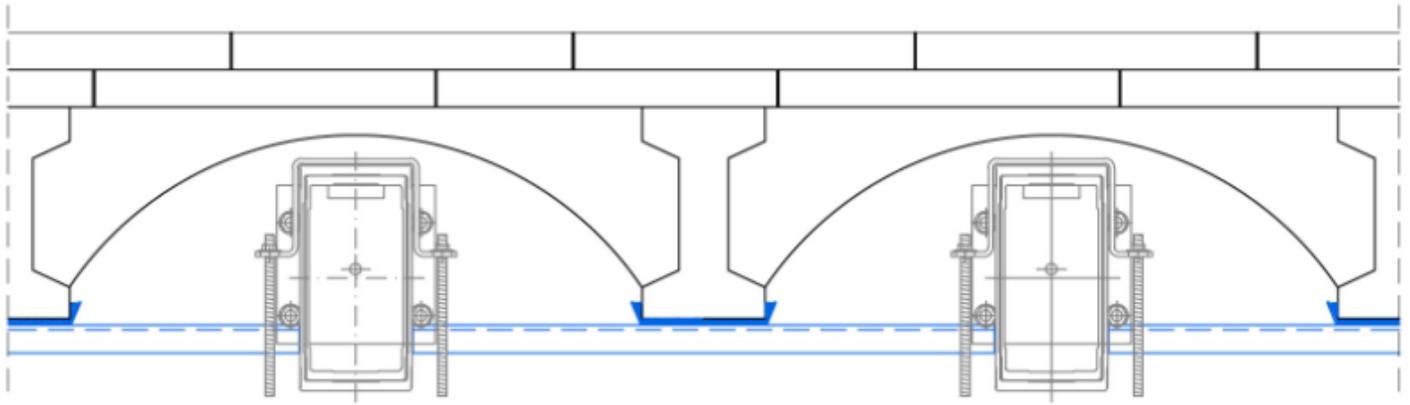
Detail of *beam between beams* installation. ©EXTEND
